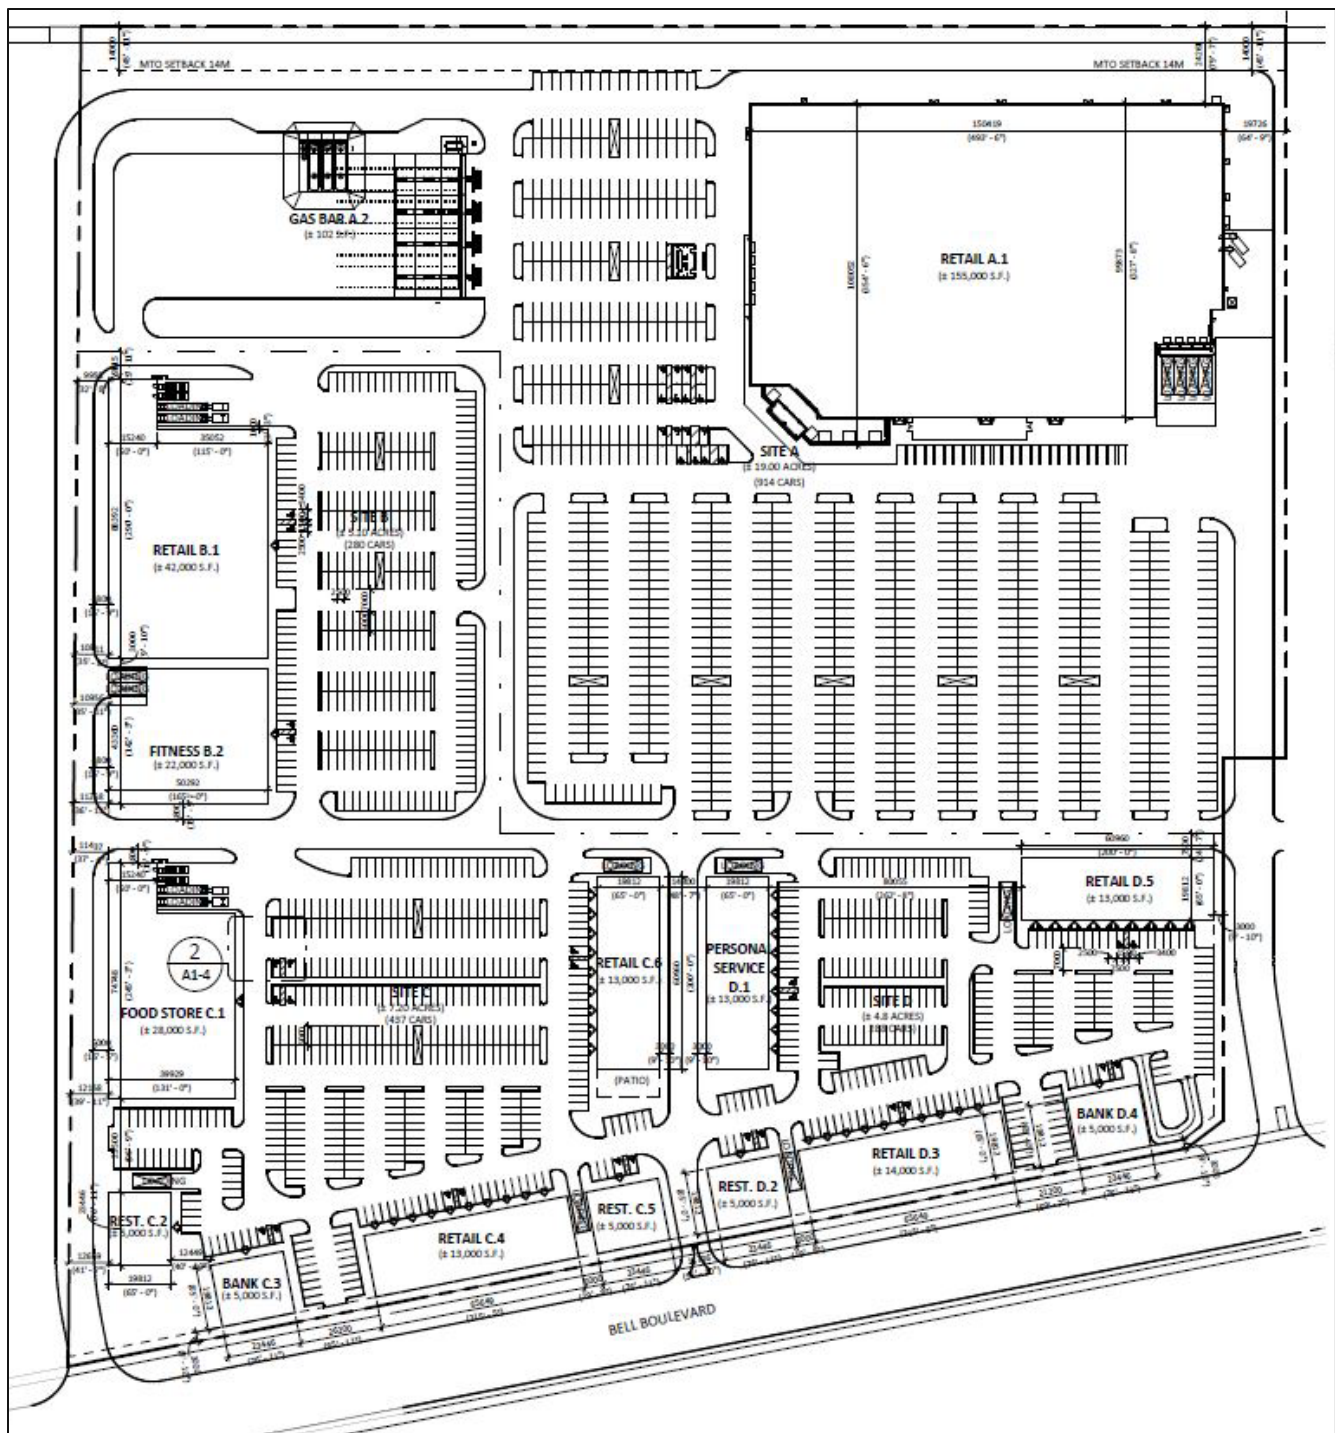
Conceptual Site Plan (source: Turner Fleischer).
